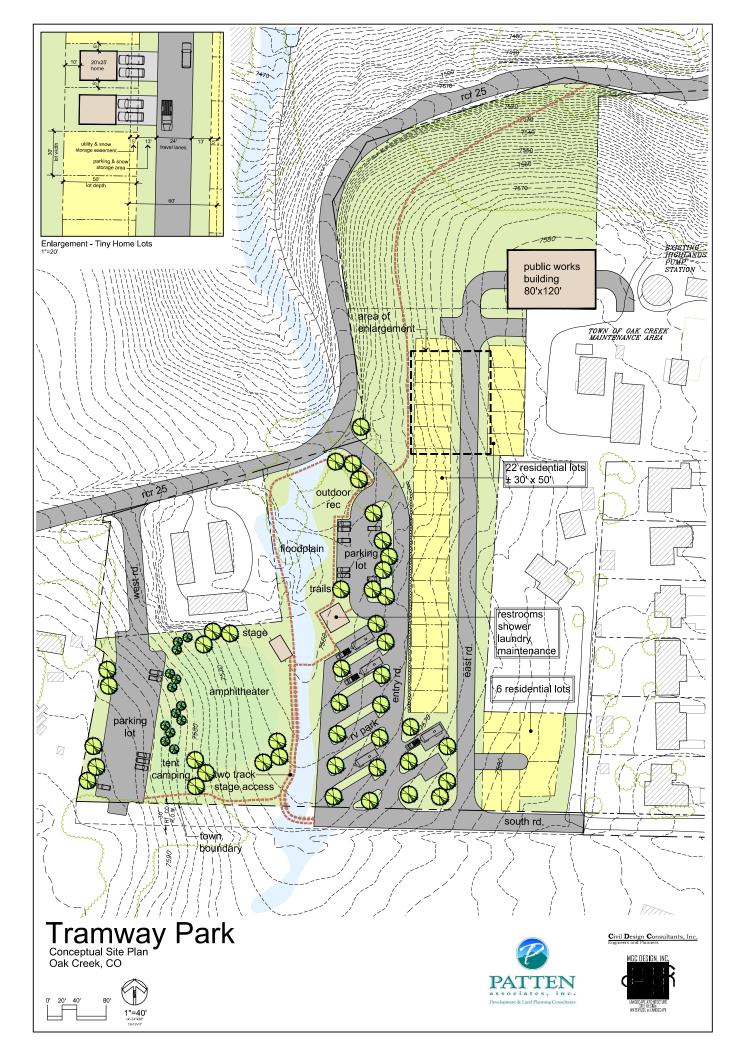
RV PARK CONCEPT PLAN – OAK CREEK RECREATION MASTER PLAN, P. 33
